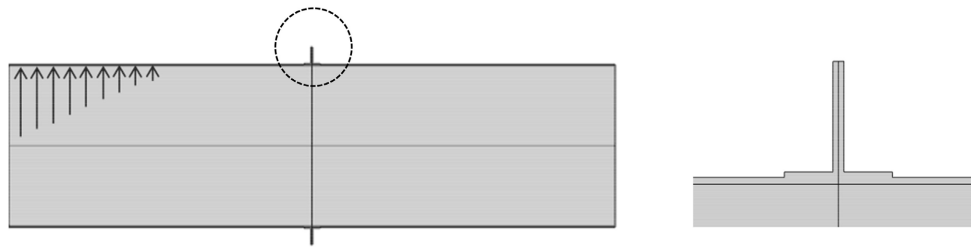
Schematic diagram of replacement pipe and connecting pipe structure
